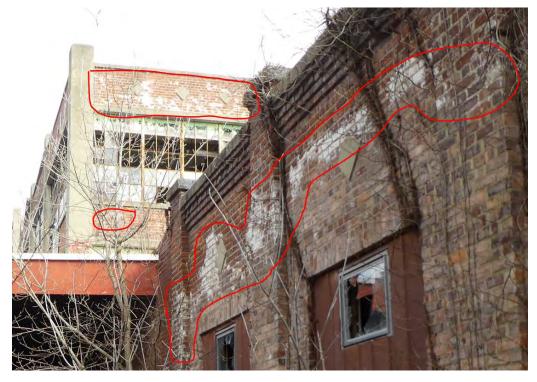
South Elevation Building 1/West Elevation Building 2. Typical occurrence of efflorescence in masonry walls.
